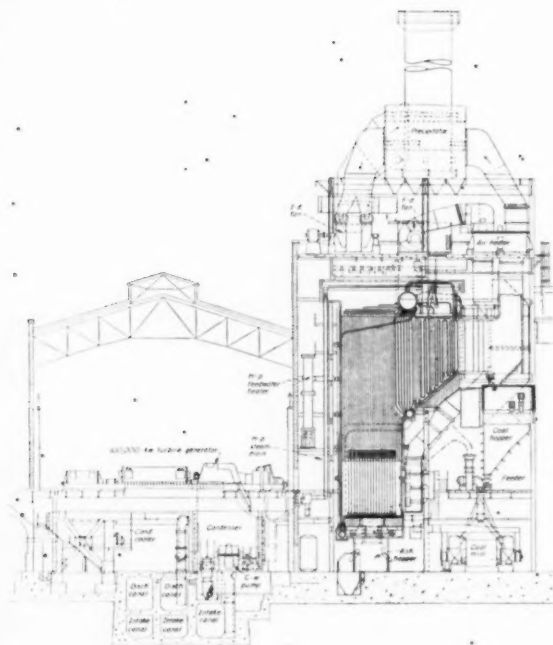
Plant Cross Section, No. 2 Unit—Sewaren
